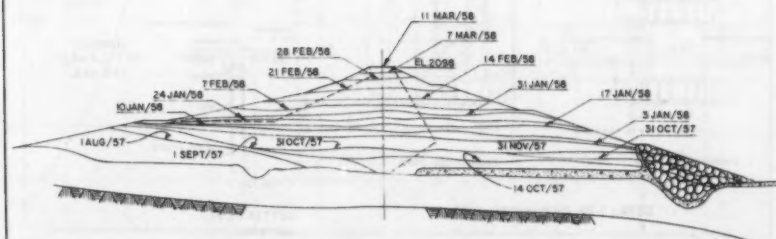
RATE OF EMBANKMENT CONSTRUCTION
